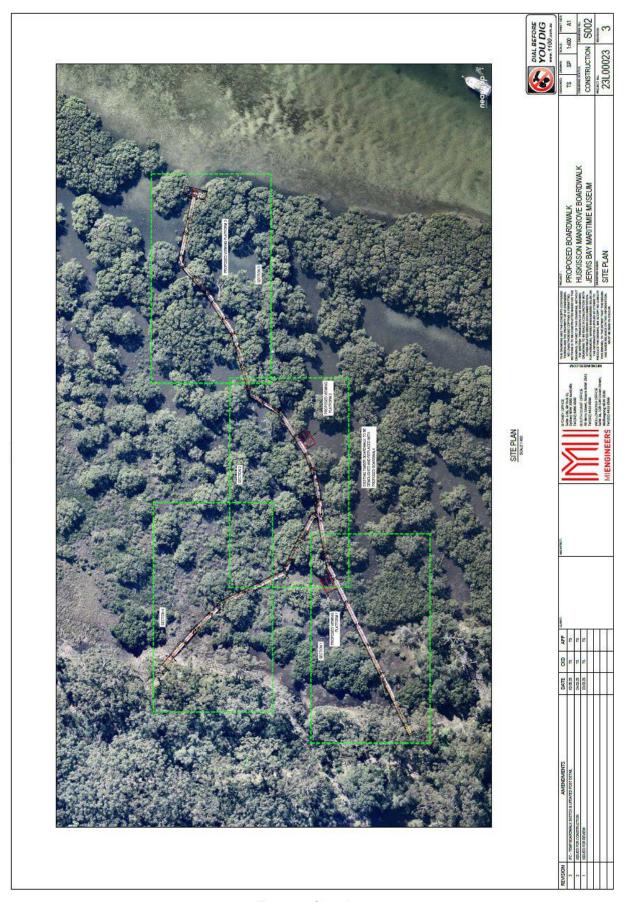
Site plan. Source: plan MIEngineers Air Photo © Nearmap
